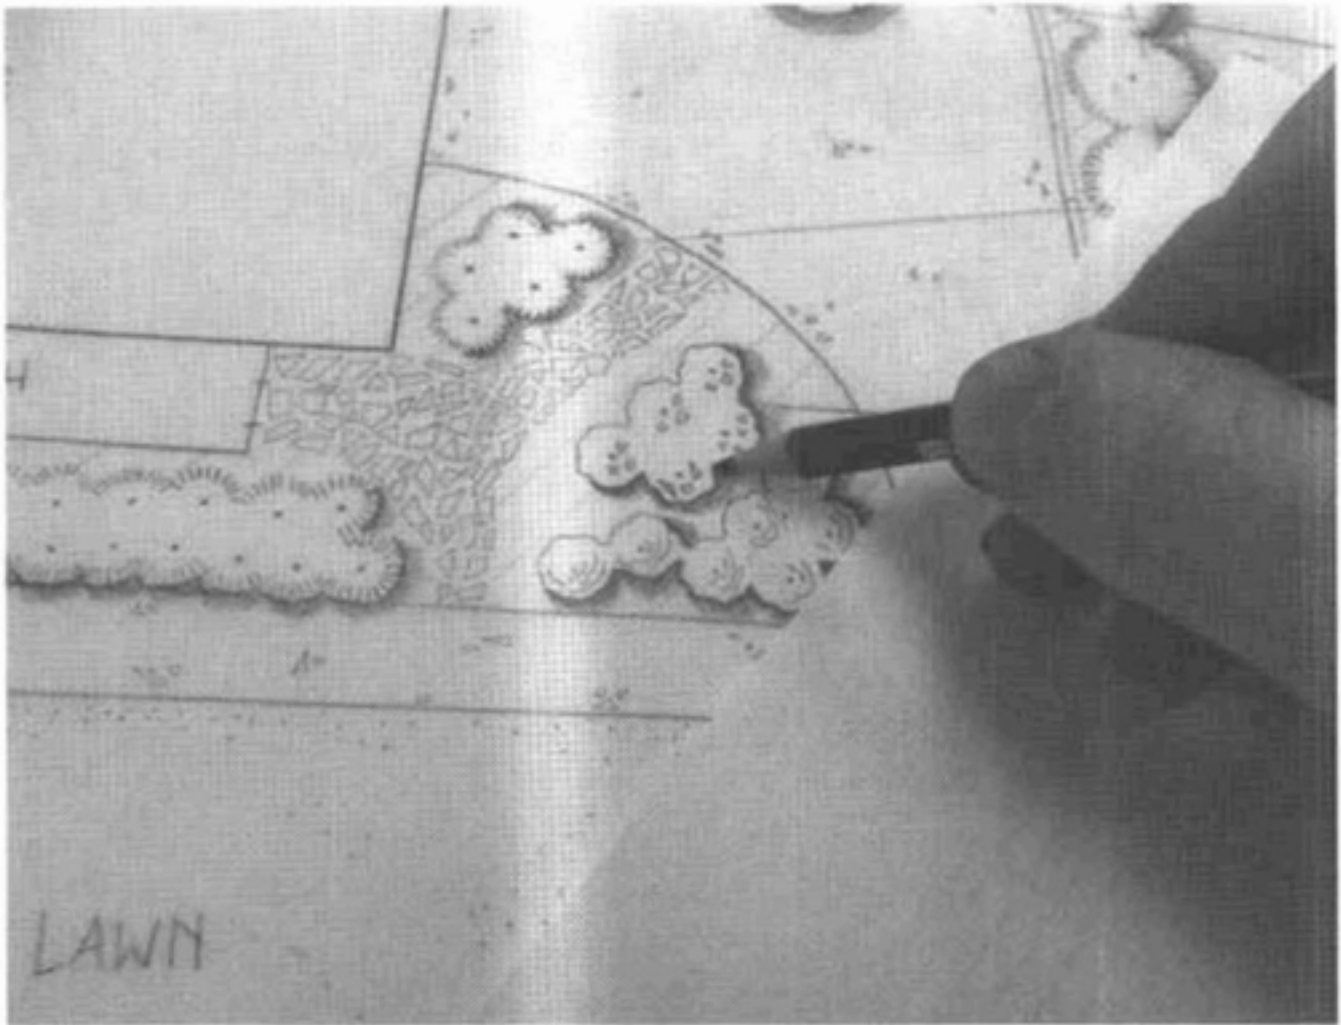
·8 Prevent Smudging Keep lines from smudging by dusting the paper before drawing and placing your drawing hand on a piece of paper.
